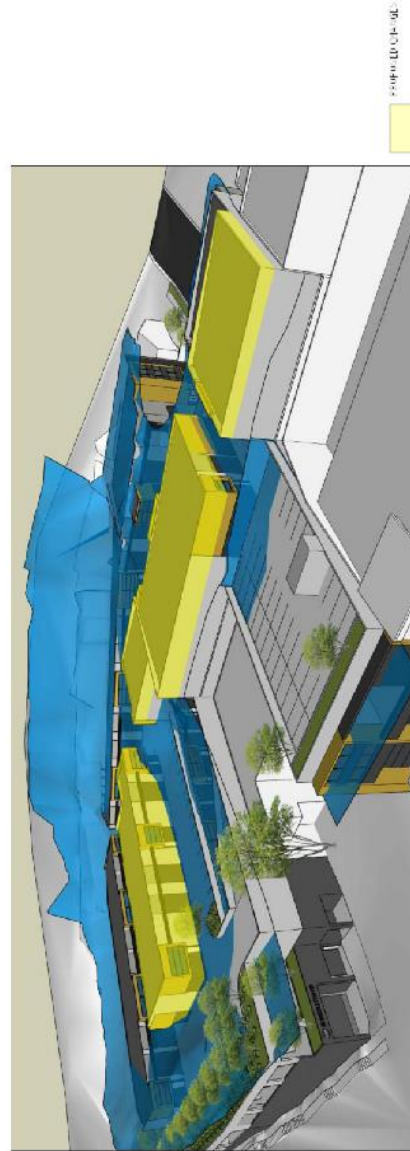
Height Plan View Diagram 01 showing the height plane in blue and the portions of the building above the height standard subject to this DA (Source: PBD Architects)
